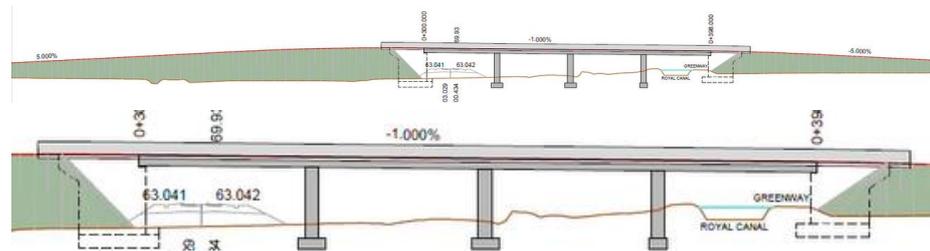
Proposed L5041 Diversion Sectional Elevation & Bridge Elevation
